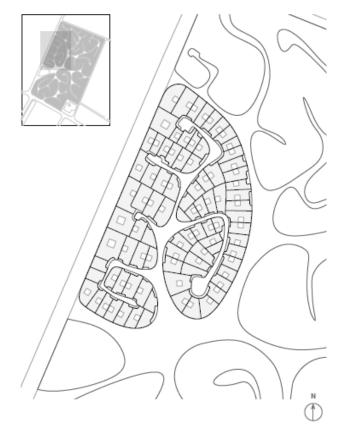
Detailed Plan of a section of the proposal showing the plot divisions, plot entrances and courtyards
